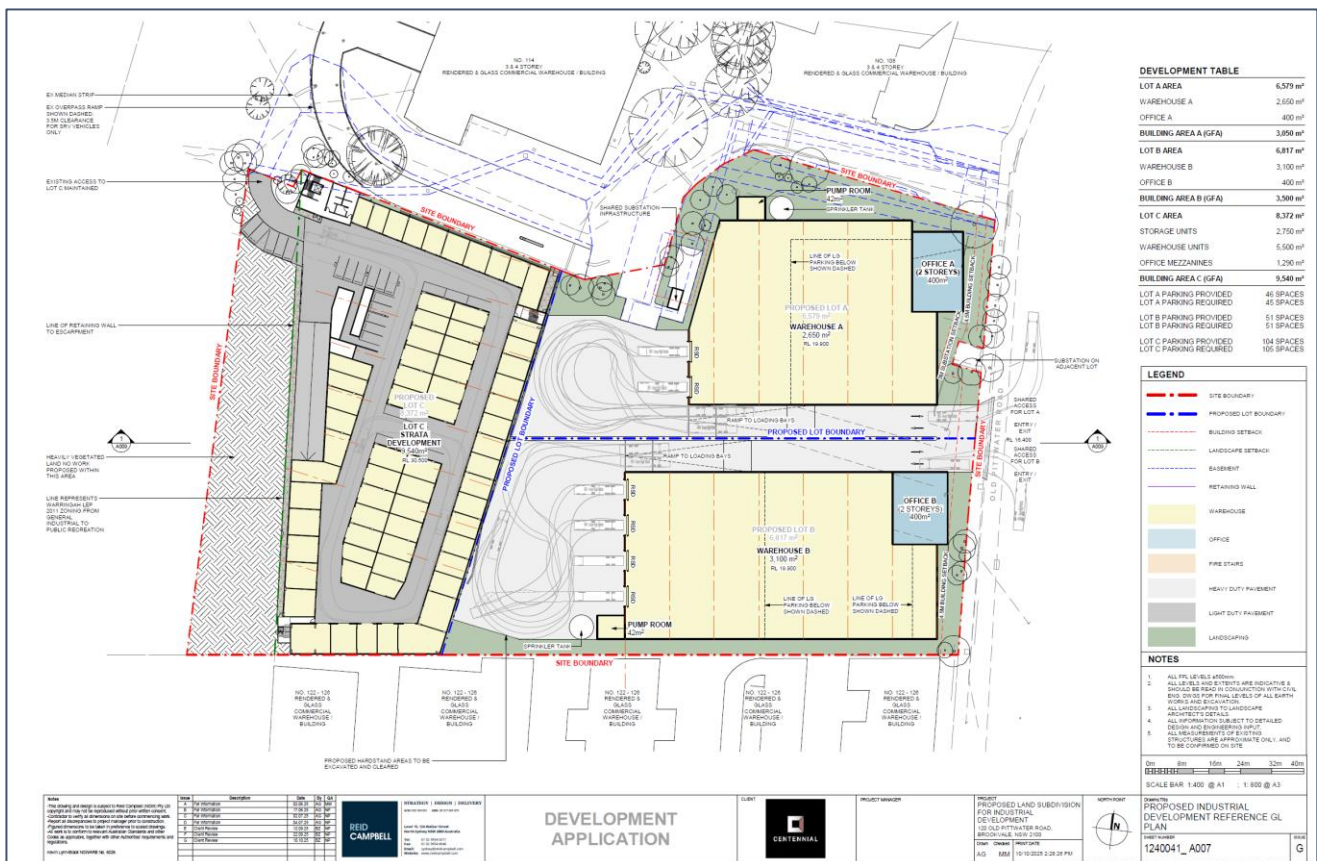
Indicative and concept ground floor plan (Source: Reid Campbell)
